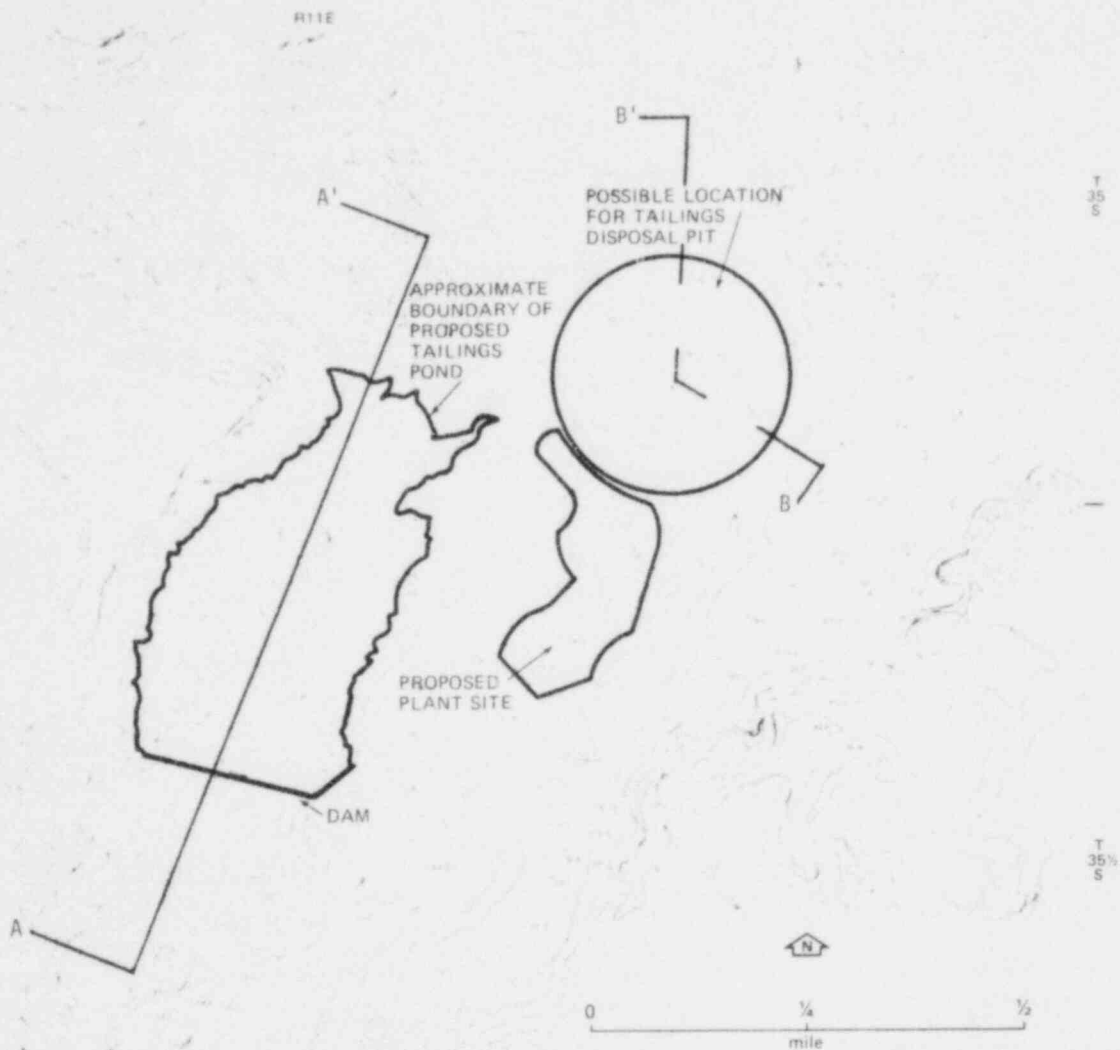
Locations of impoundment pond and pit disposal alternatives for the Shootering Canyon Uranium Project. See also Fig. 10.4. Source: Adapted from Plateau Resources, Ltd., *Evaluation of Tailings Disposal Alternatives, Shootering Canyon Uranium Project, Utah*, prepared by Woodward-Clyde Consultants, San Francisco, Calif., Rev. December 1978, Fig. 2.
